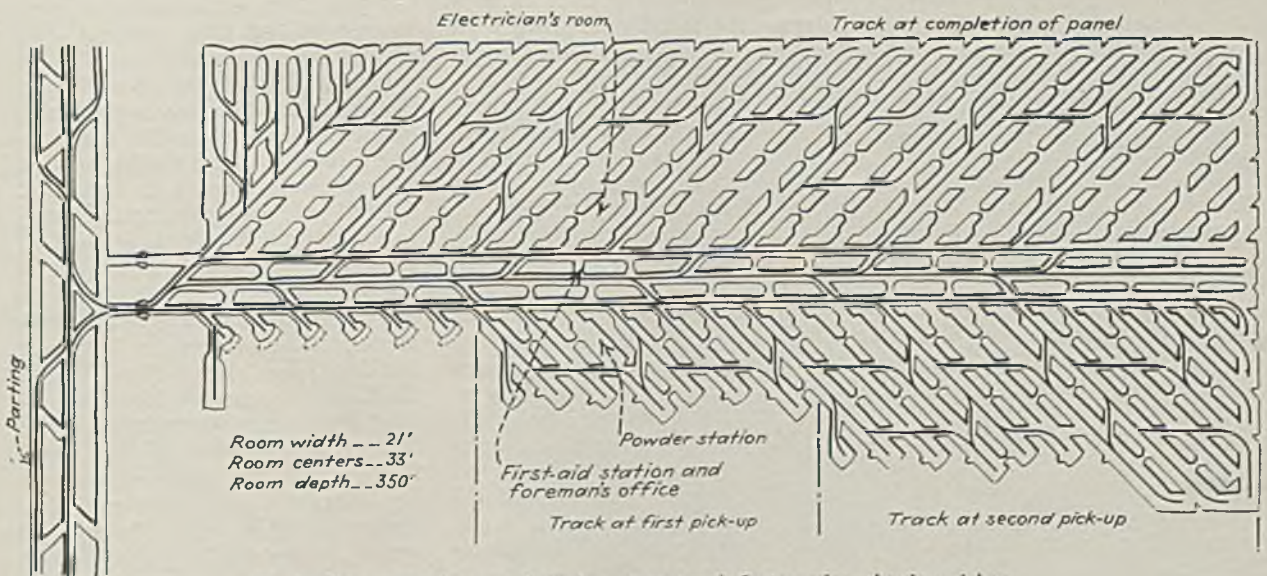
Diagrammatic plan of 45-deg. room panel, Saxton mine, showing pick-up plan at various stages of room advance and (above) track layout at final stage of development
